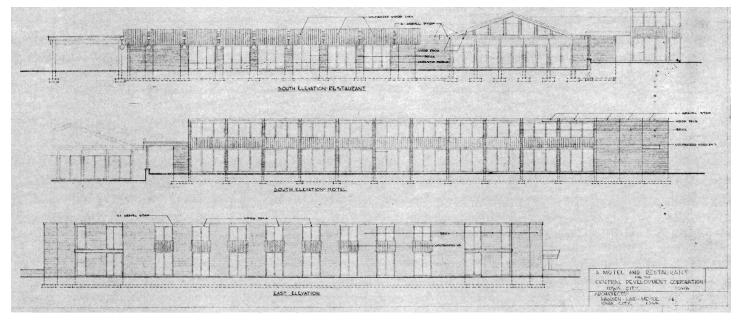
Three elevation views for "Motel and Restaurant" (Hansen, Lind and Meyer, Architects)
